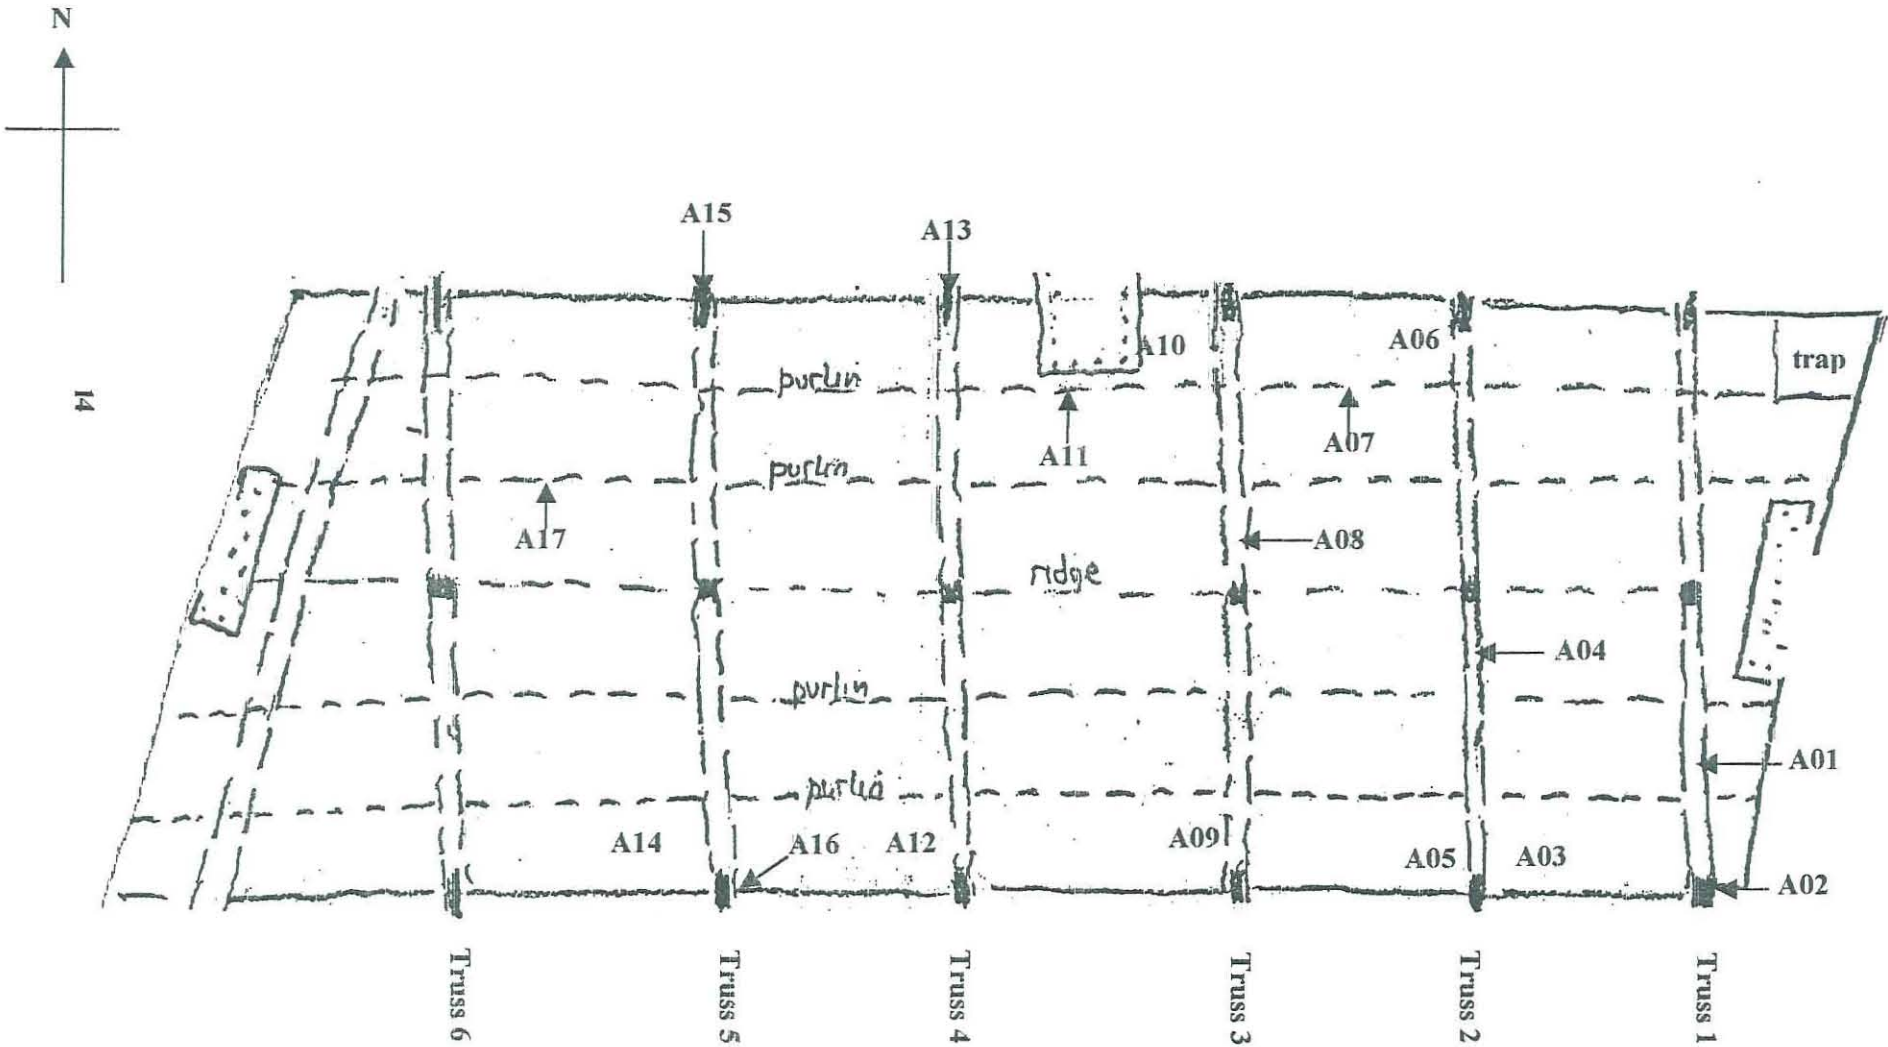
Sketch diagram to show sampled timbers from the rigging loft ground-floor ceiling (based on architectural drawing)
